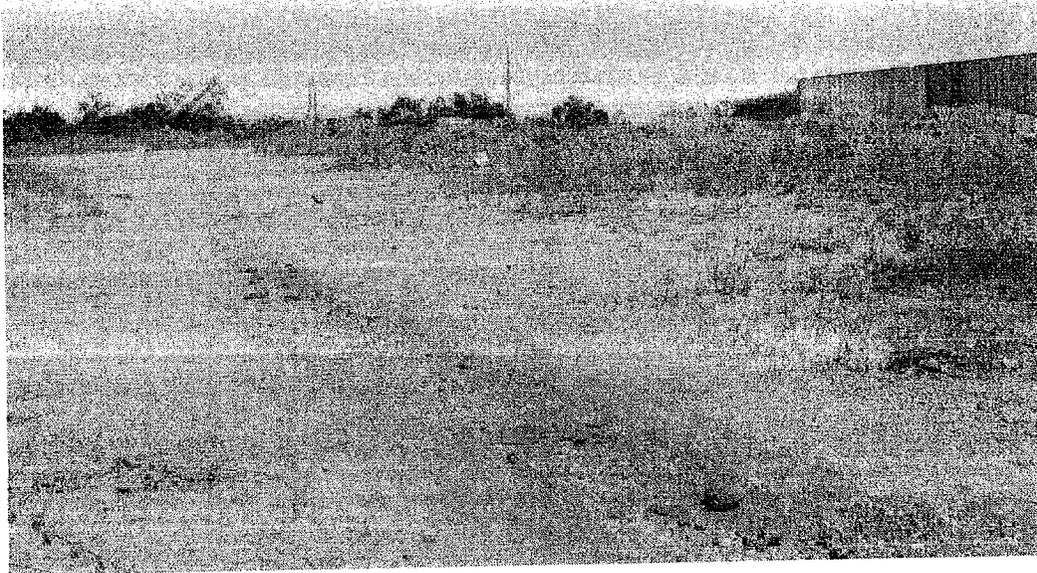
Fill placed by Maderas 3C to expand their industrial lot. Levee access ramp will be located through this fill.
